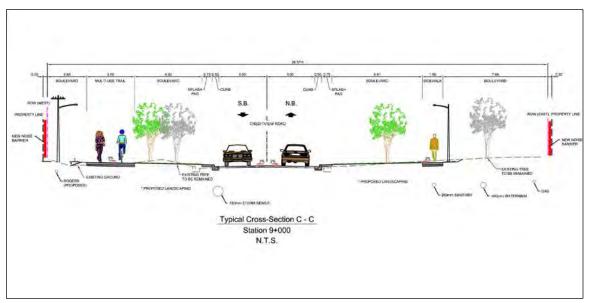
Creditview Road Class EA, Preliminary Preferred Alternative: Typical Cross-Section C-C at Station 9+000 [AECOM, 2015].
